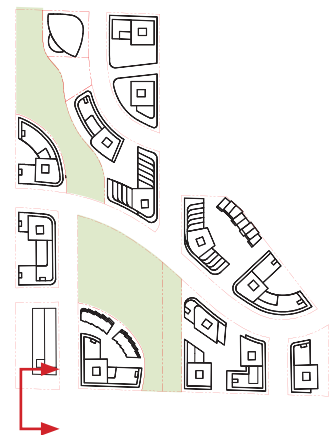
West 37<sup>th</sup> Avenue (West of Baillie Street)
